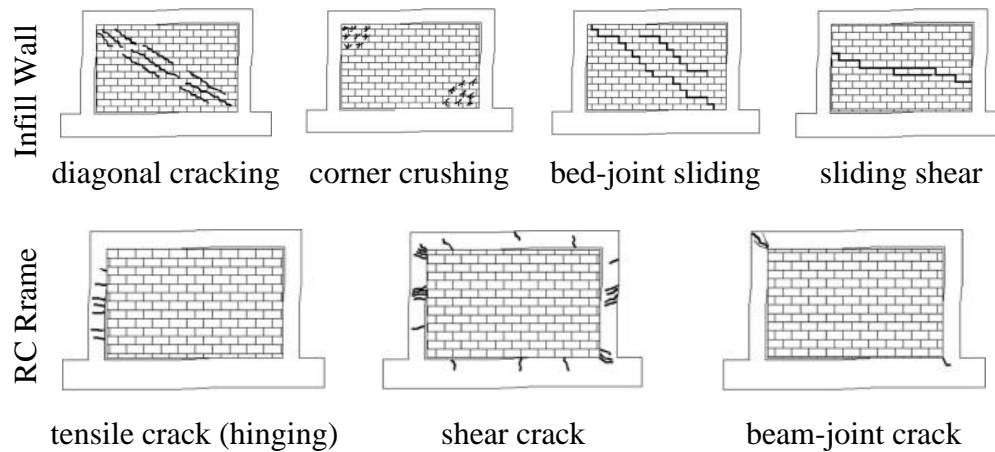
IP failure modes of infilled frames (Šipoš et al, 2013)
